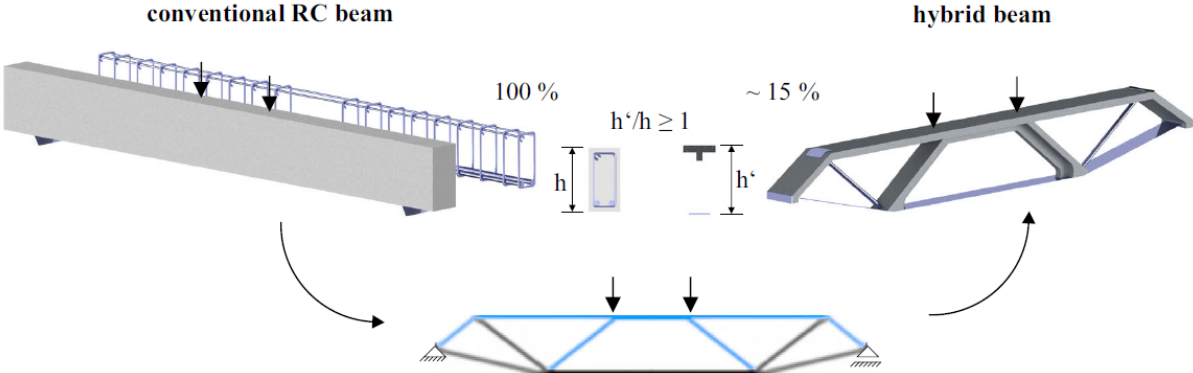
Transformation of a conventionally reinforced concrete beam to a weight-optimized hybrid concrete-steel beam by means of topology optimization [5]
